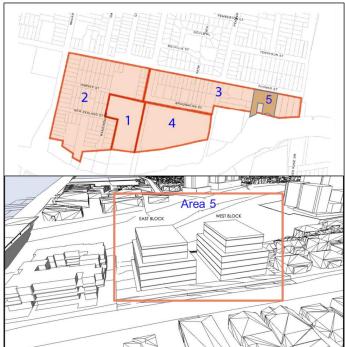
Map of Morton Street Precinct DCP and Indicative Building Envelope for Area 5
